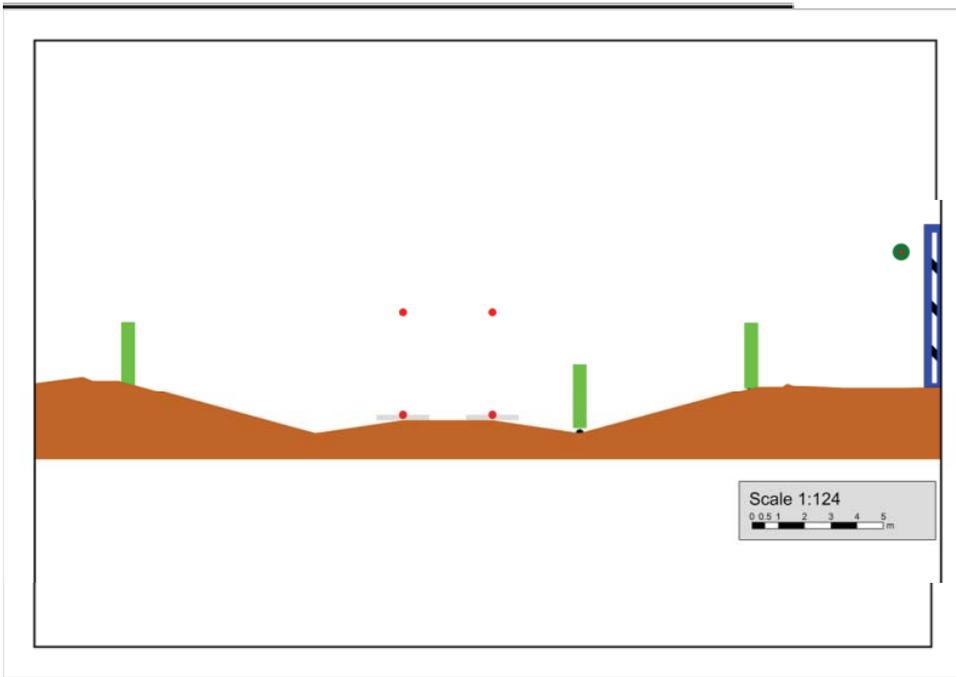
Cross Section at ES 15, Qudrangle House, St. Peters Road
